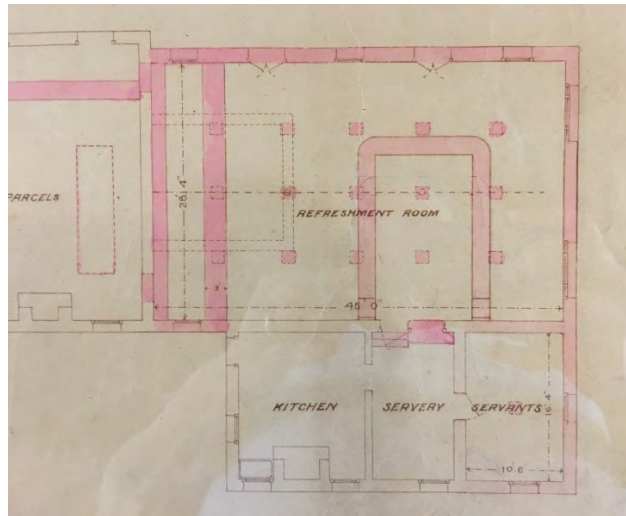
Floor plan of refreshment room and additional room in kitchen wing – new additions are shown in pink. Source: QSA Series 17692 Plans of Queensland Railway Station Buildings etc., Item ID 120966
